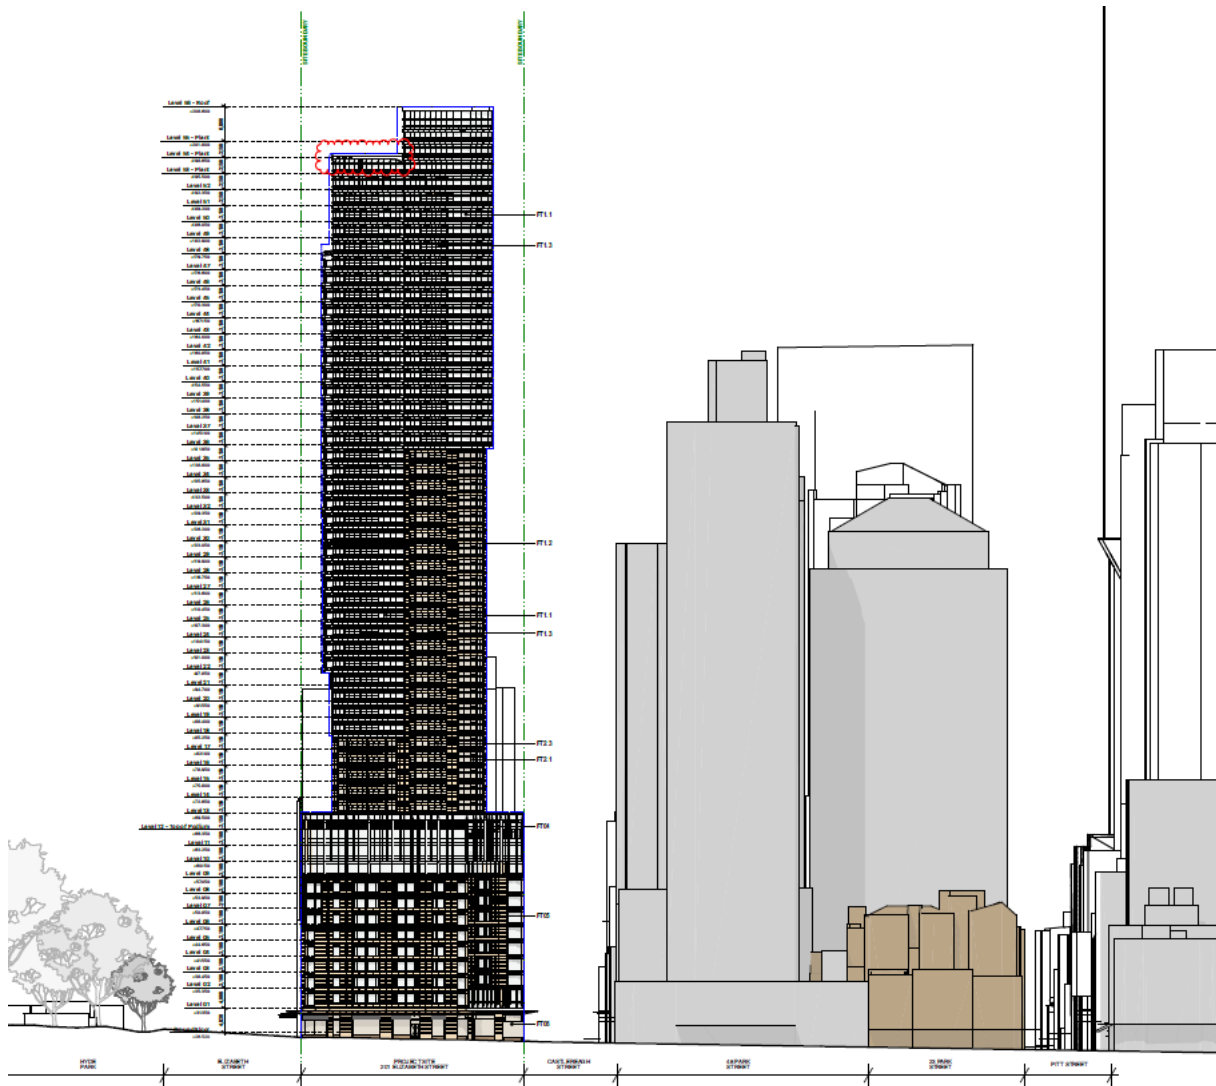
| Proposed north elevation (Source: Ethos Urban RtS amended architectural drawings)
